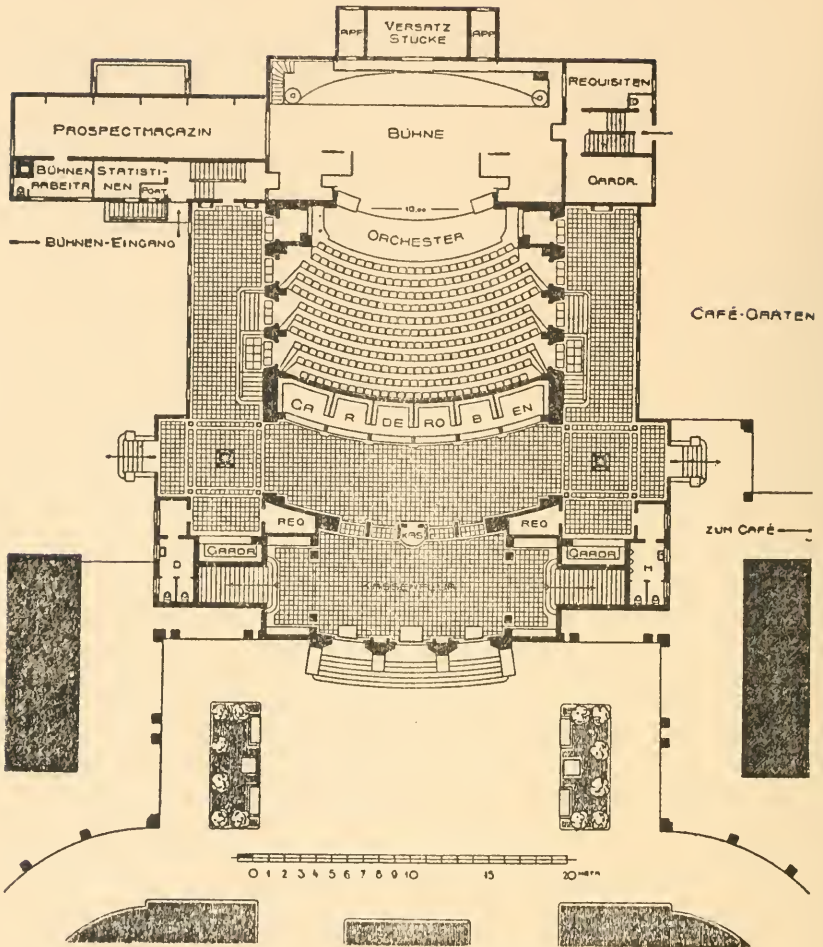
First-floor plan of the Munich Art Theatre. Note that the seats shown here form only a part of the main floor section, as indicated in the plans on the page opposite. Max Littmann, Architect.
